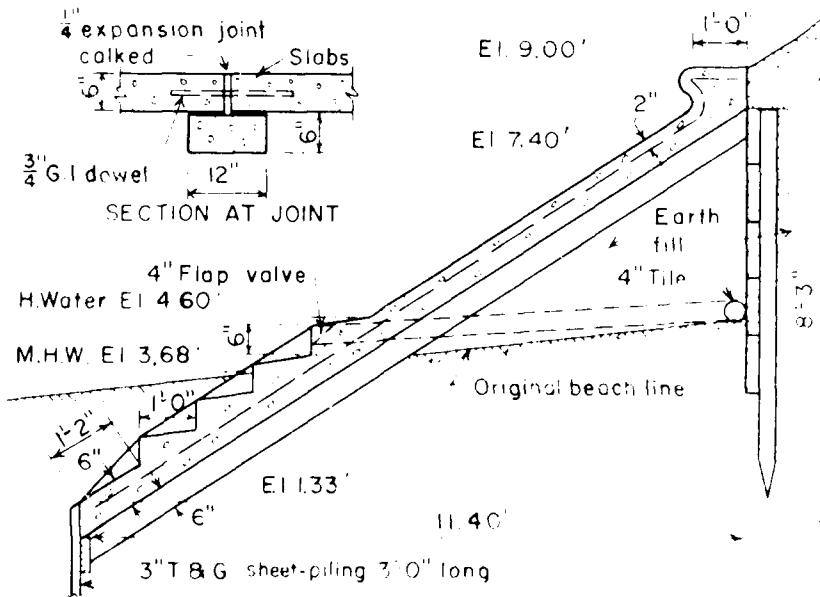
Concrete revetment (U.S. Army, Corps of Engineers, CERC, 1977).
